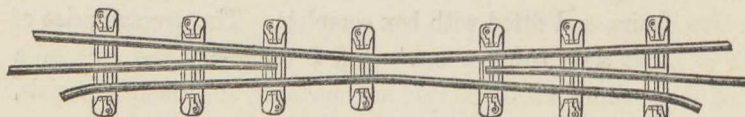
HALF SET OF ANGLES OR OVER CROSSING. SECTIONS N° 1 & 2.
